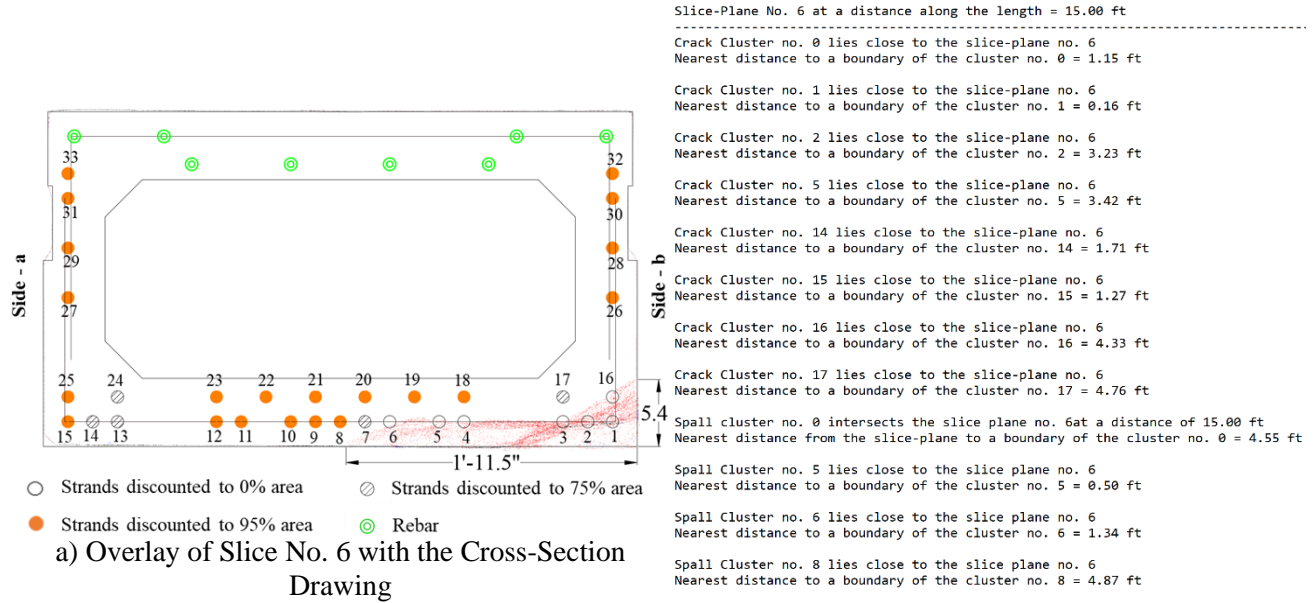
Tools for Strength Estimation at Slice-6 on Aden Road Bridge Box Beam-3
